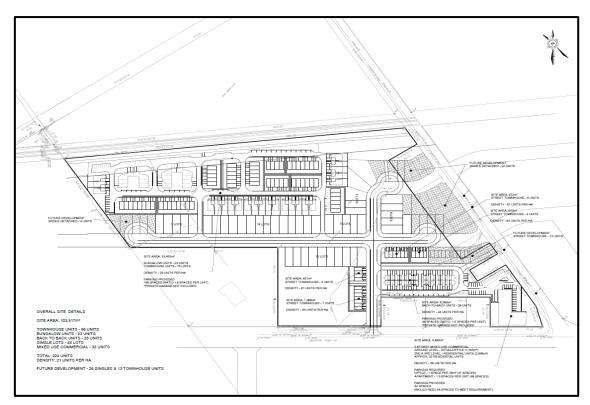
Preliminary Concept Plan for the Proposed Development, prepared by IBI Group
